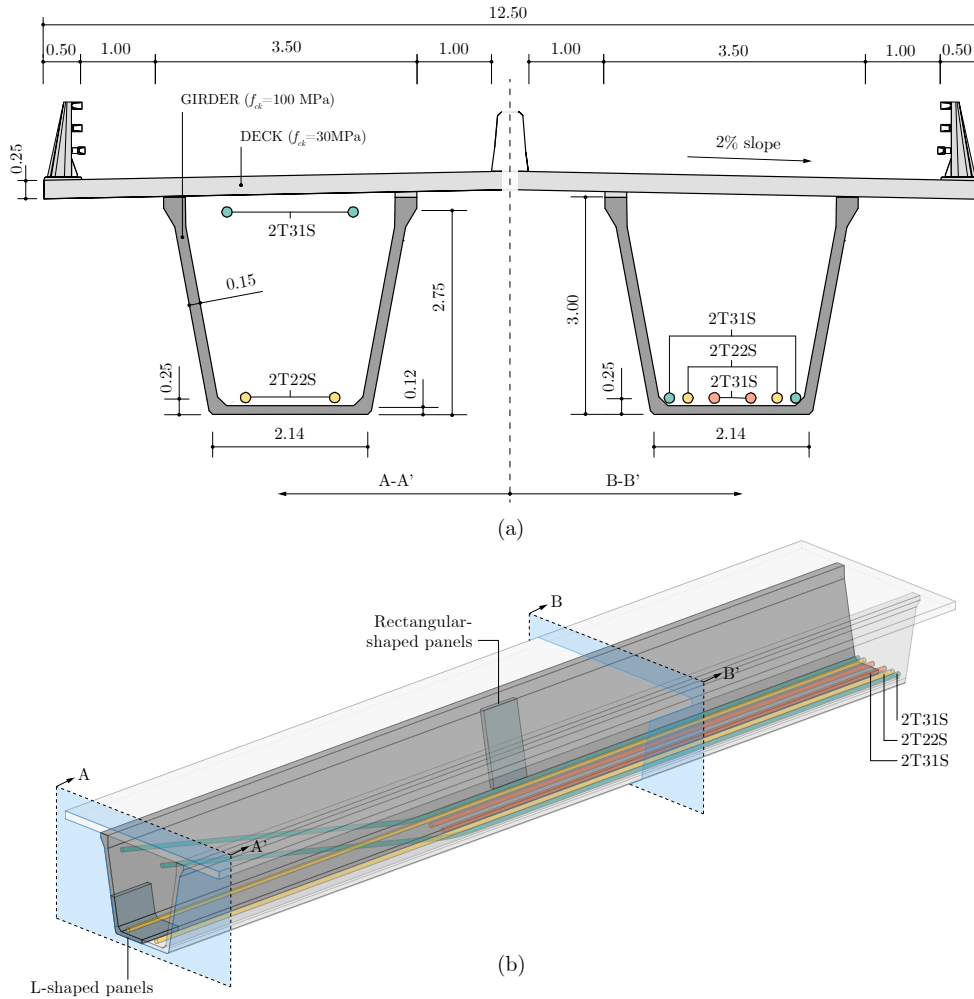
HPFRC-based alternative for a road bridge spanning 60 meters. (a) cross-sections with HPFRC U-girder and conventional RC deck at midspan and supports; (b) 3D representation of half HPFRC-based bridge.
